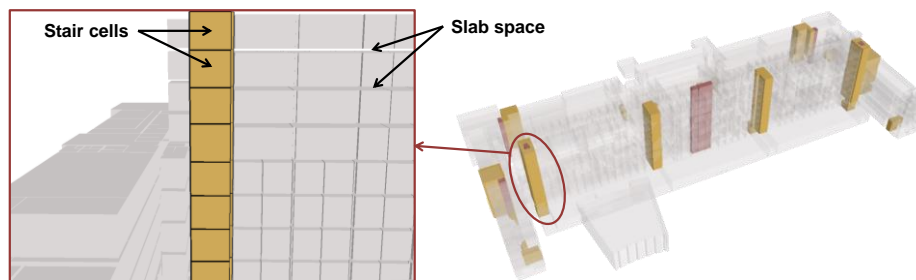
Space cells representing stairs and elevators were ensured to touch over subsequent building floors.
